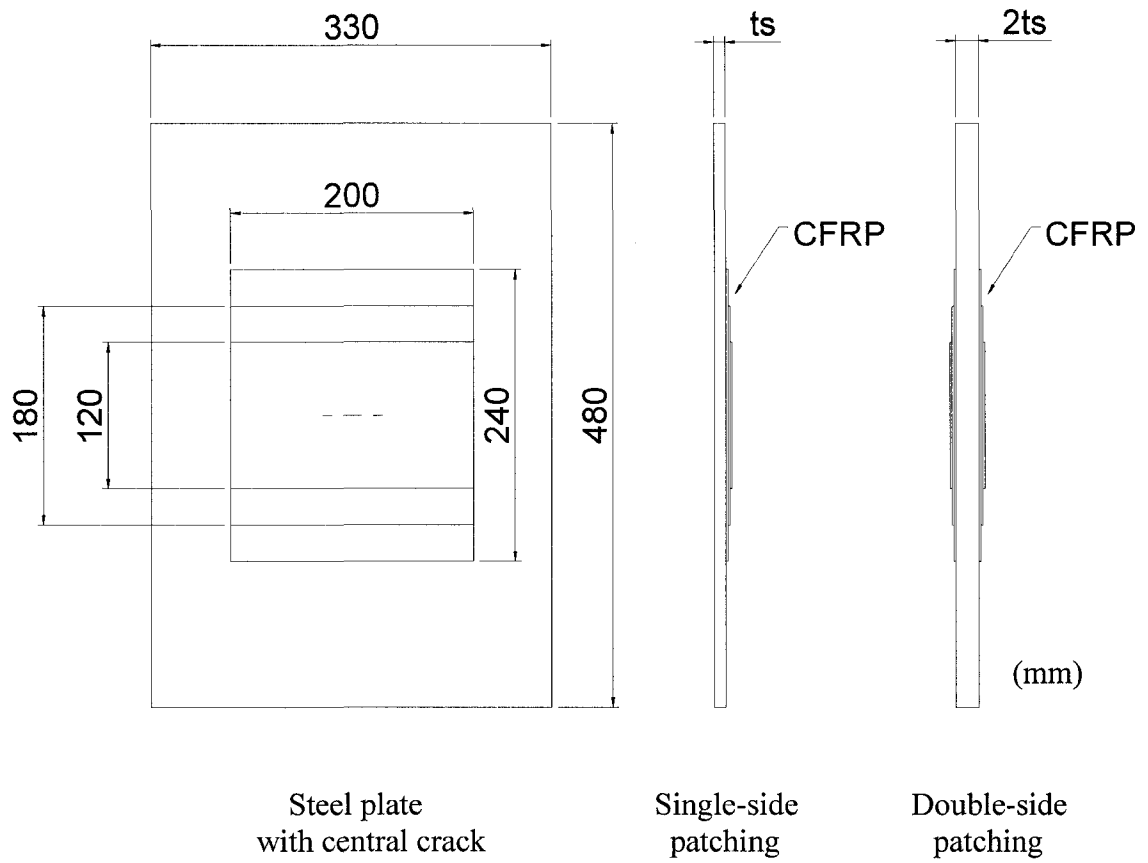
Steel plate with central crack, single-side / double-side CFRP patching
